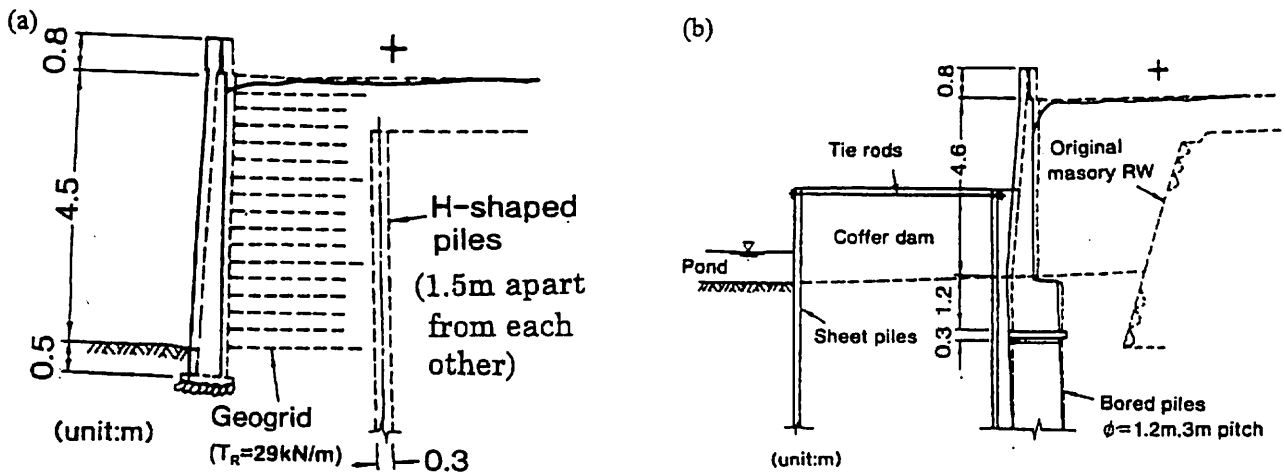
Cross-sections before and after the earthquake of slightly damaged RWs at Tanata; a) a GRS-RW having a FHR facing (n.b., effects of the H-piles on the wall stability are considered to be very small); and b) a RC RW supported with a row of bored piles.
